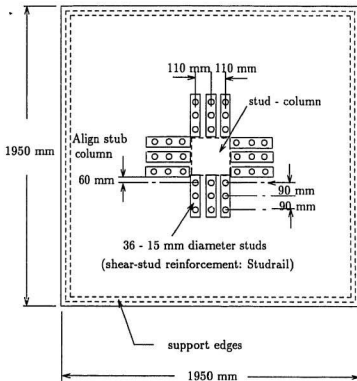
Arrangement of shear-stud reinforcement (Studrail) in Slab HS22
